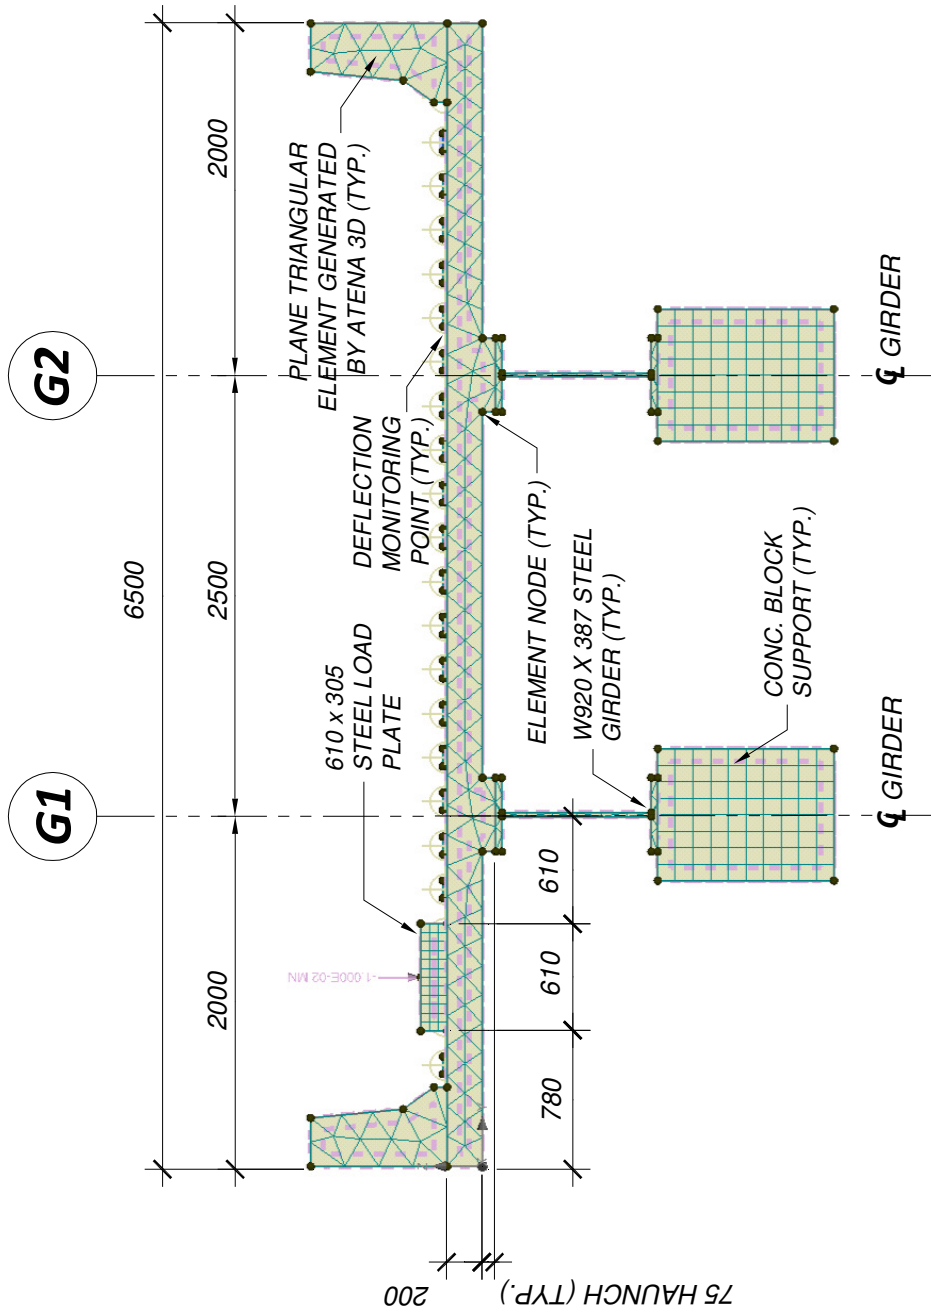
(a): Plan view of finite element discretization for cantilever sections
